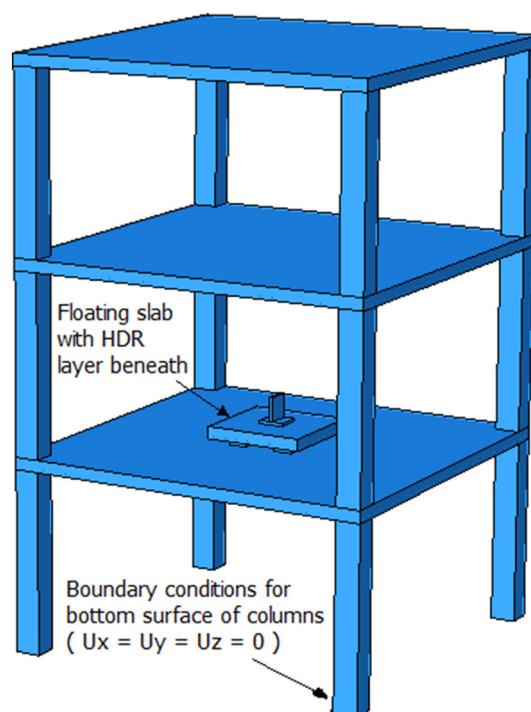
3D model of the three-story, one-bay building with Hybrid Rubber-Concrete Isolation Slab System (HRCISS) in the first story
